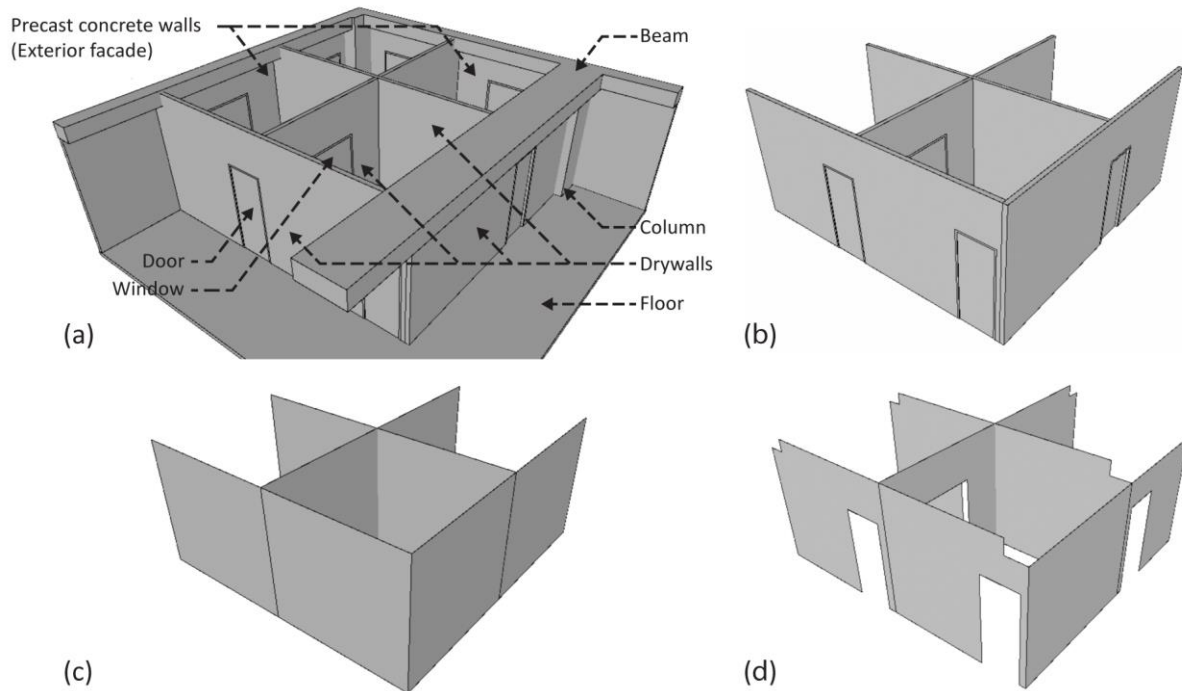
(a) Building model elements are imported from a BIM model to the system. (b) Wall elements that are not drywalls are discarded. (c) Wall surfaces created by the system. (d) Overlapping building elements are subtracted from the wall surfaces.
